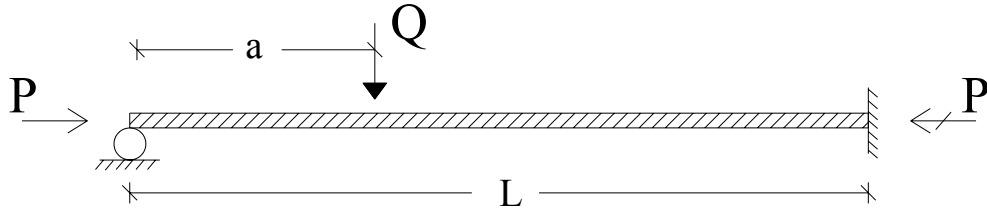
Propped Cantilever Beam-Column with Point Load at Span
